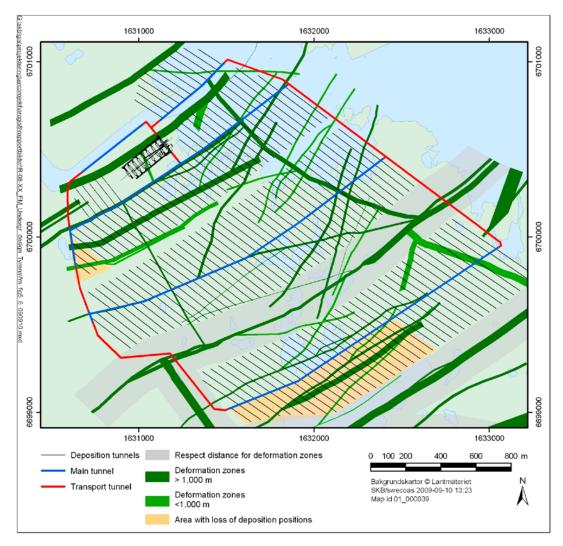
Presentation of short deposition tunnels or tunnels with significant loss. Section at –470 m (RHB 70).
